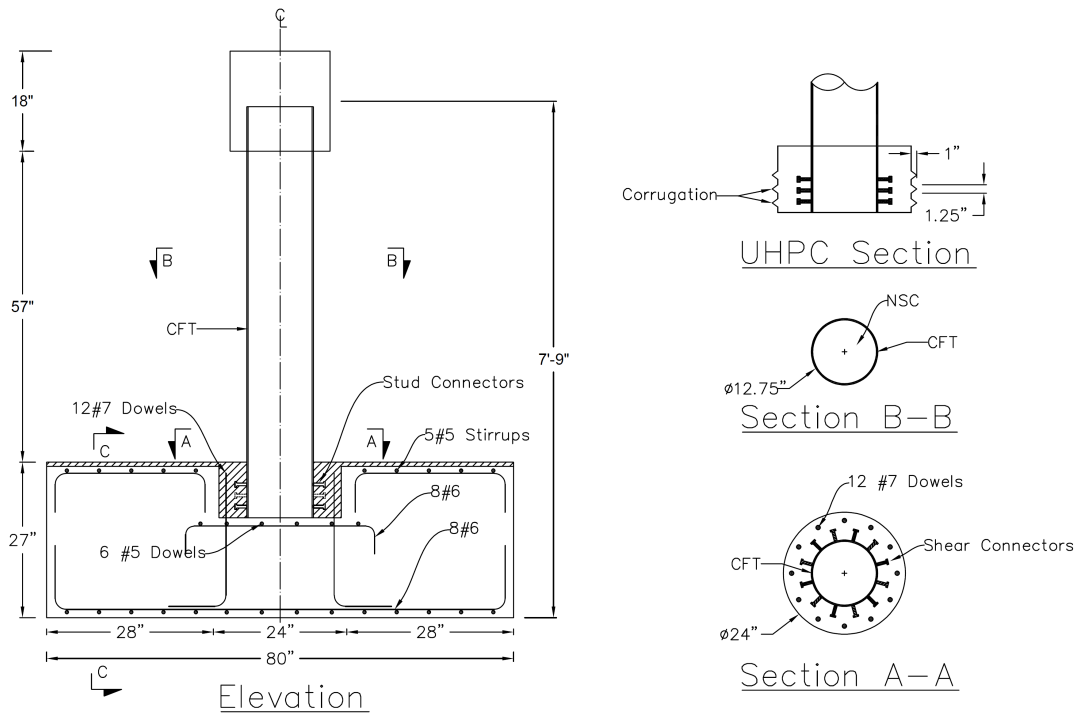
Schematic detail of specimen-3 showing dimensions and reinforcement details.
